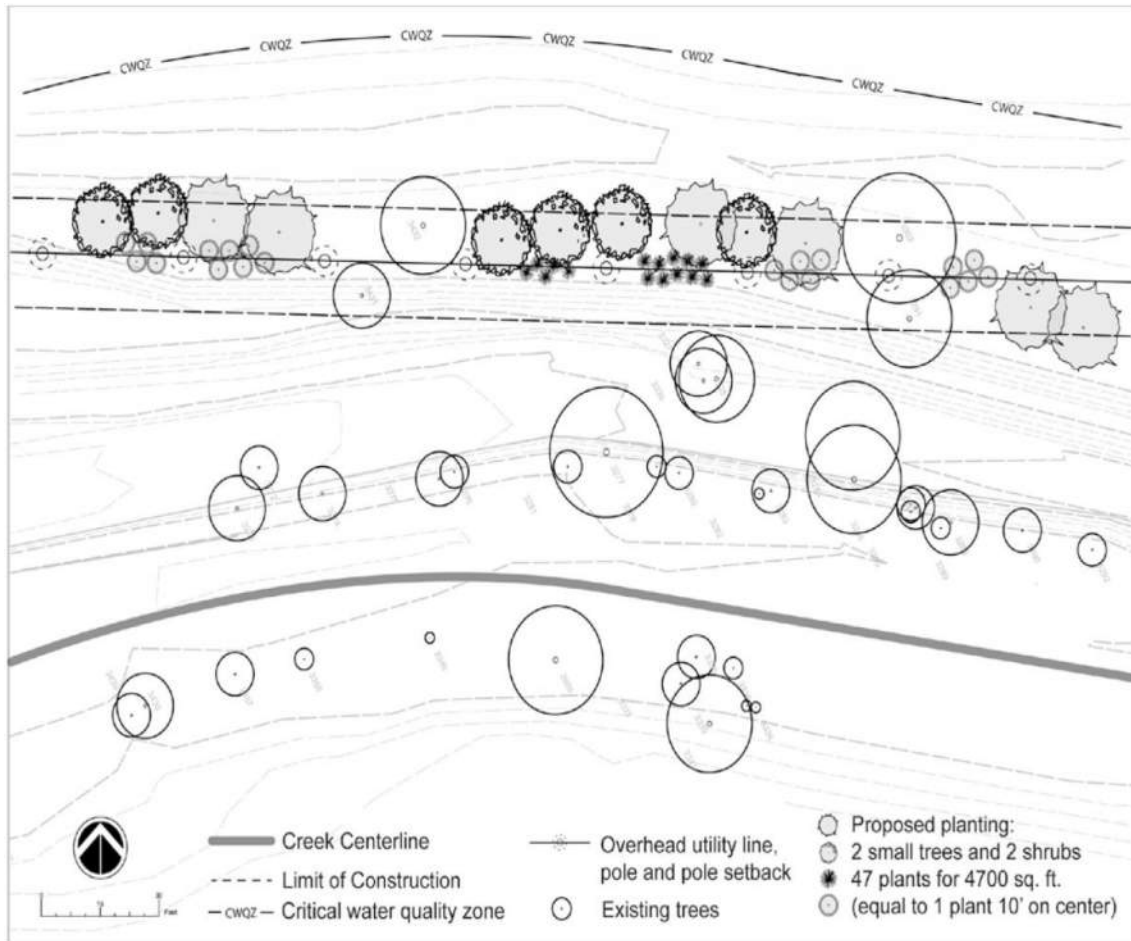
S.5-1: Example of Rooted Plant Layout and Calculation
